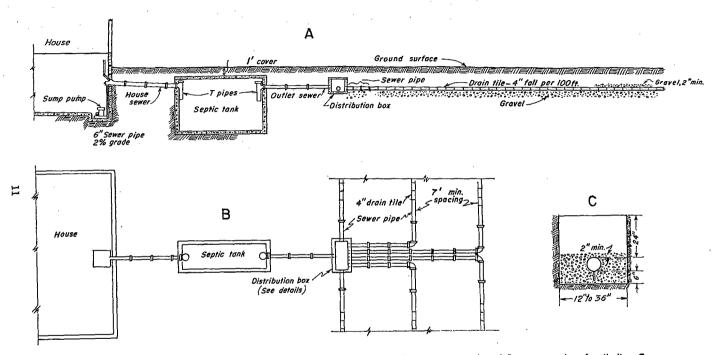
Standard trench absorption field: cross section and plan view of entire system, A and B; cross section of a tile line, C.
